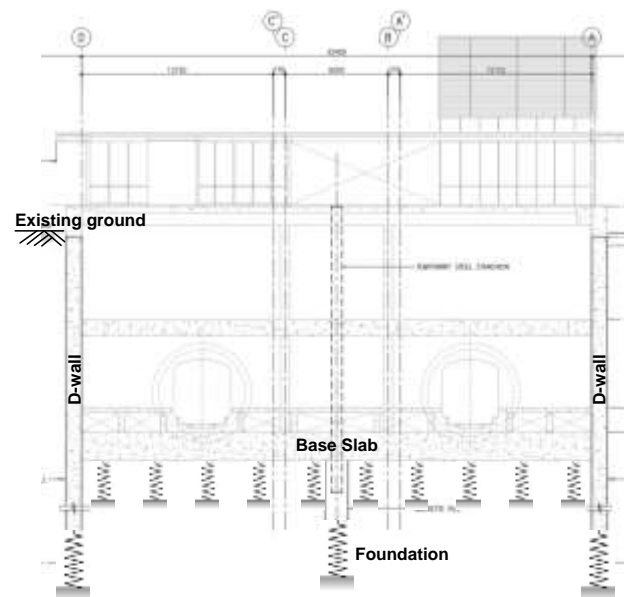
Model of pile raft foundation with spring supported for MRT station.
